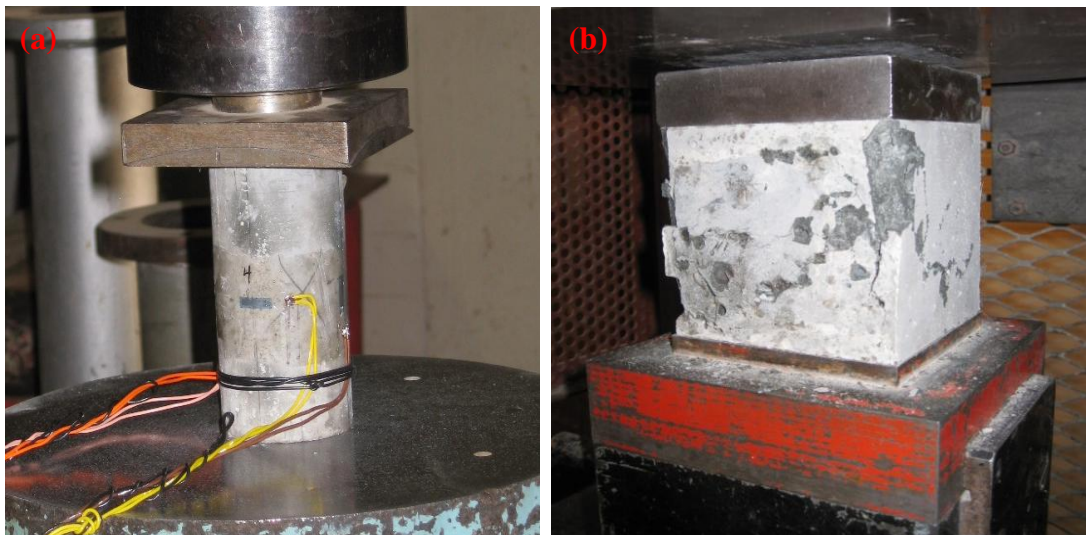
Static test setup for the: (a) cylinder specimens, and (b) cube specimens.
